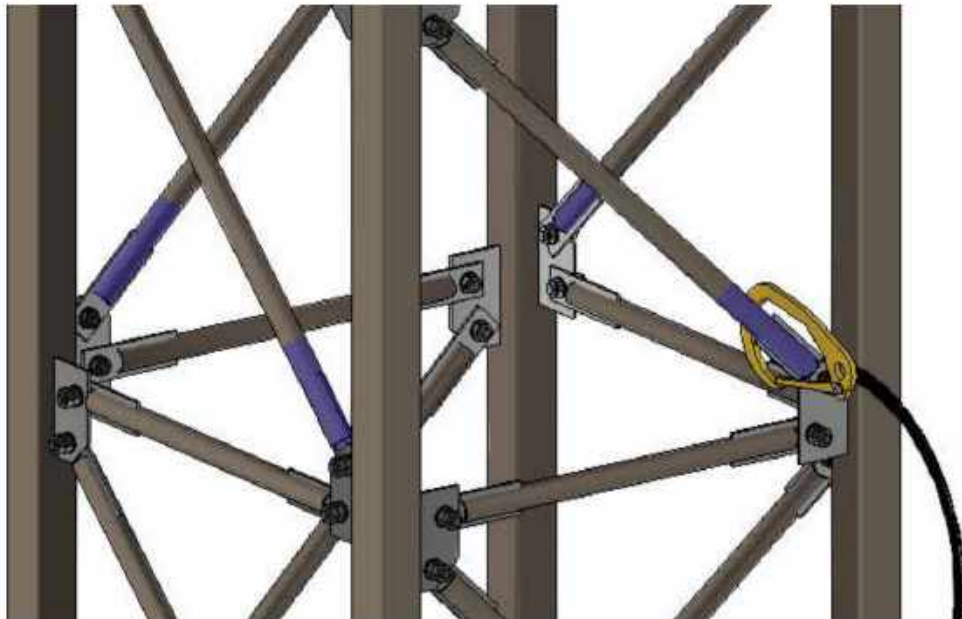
Lanyard Hook must be placed around diagonal tower web above bracing connections only (purple shading)
